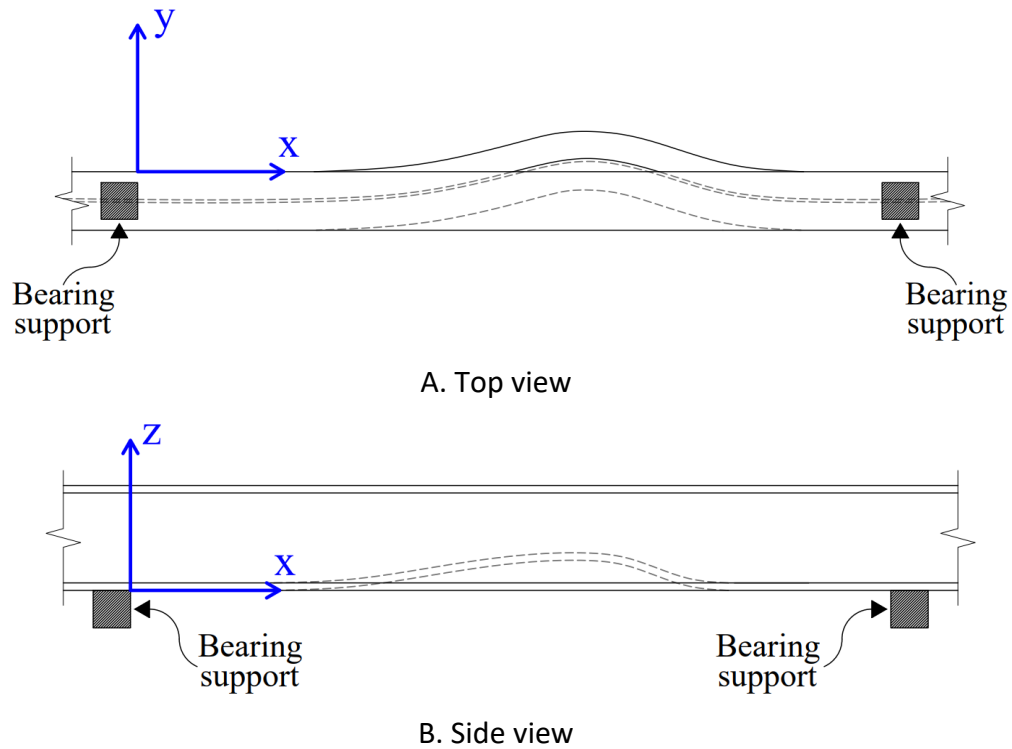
Schematic. Girder orientation for damage measurements.
